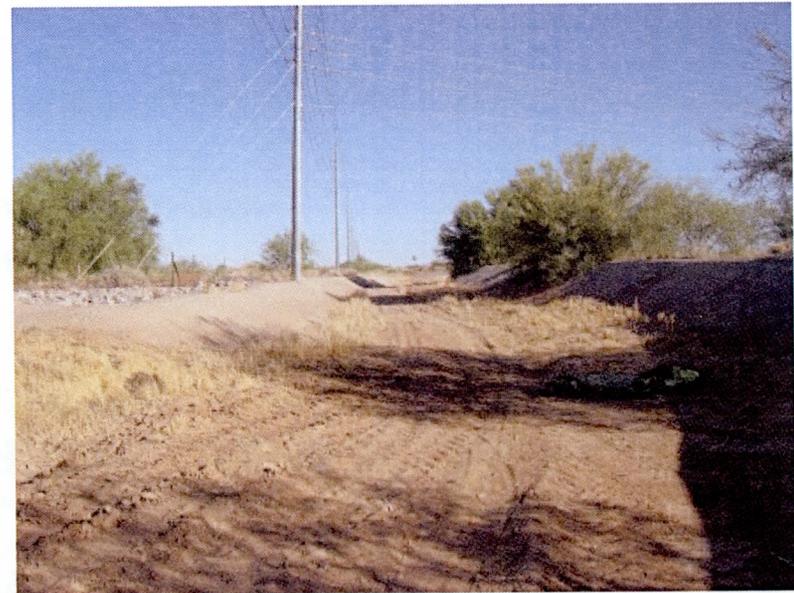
Looking NW at the intersection of ditch in picture #261 & #263.
